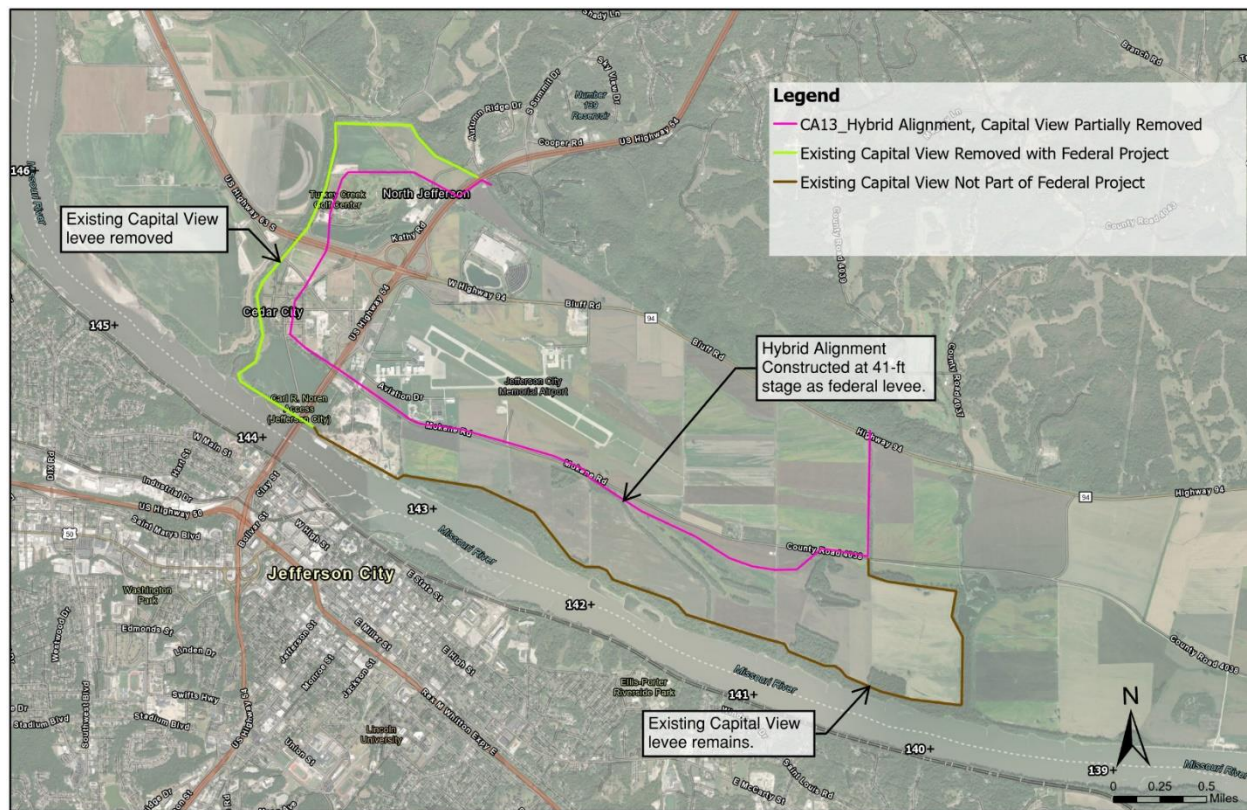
Federal Interest Plan (CA13) Levee Alignment
